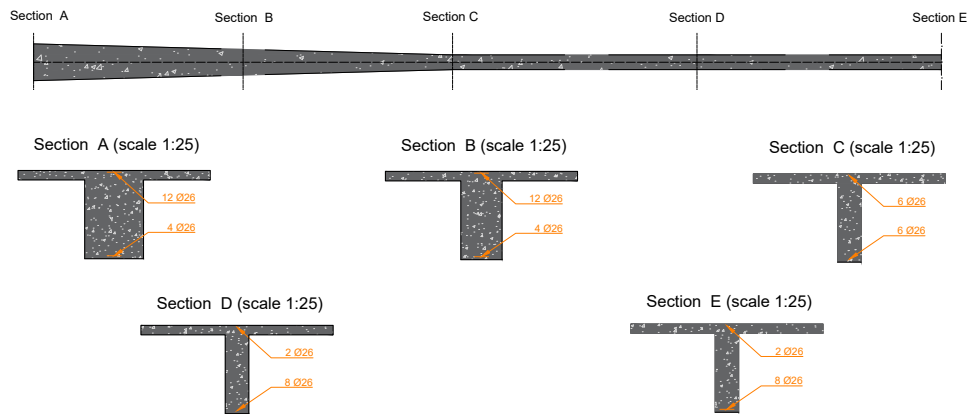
Longitudinal and transversal sections of the slab floor beams. From Drawing 2.
